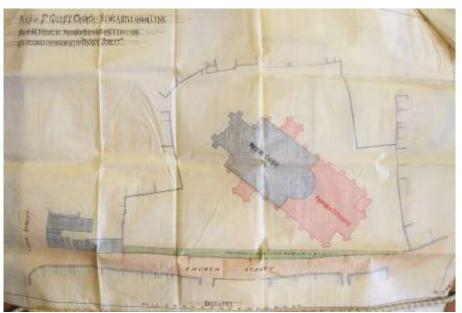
Plan of the proposed extension of the church and churchyard 1873.
